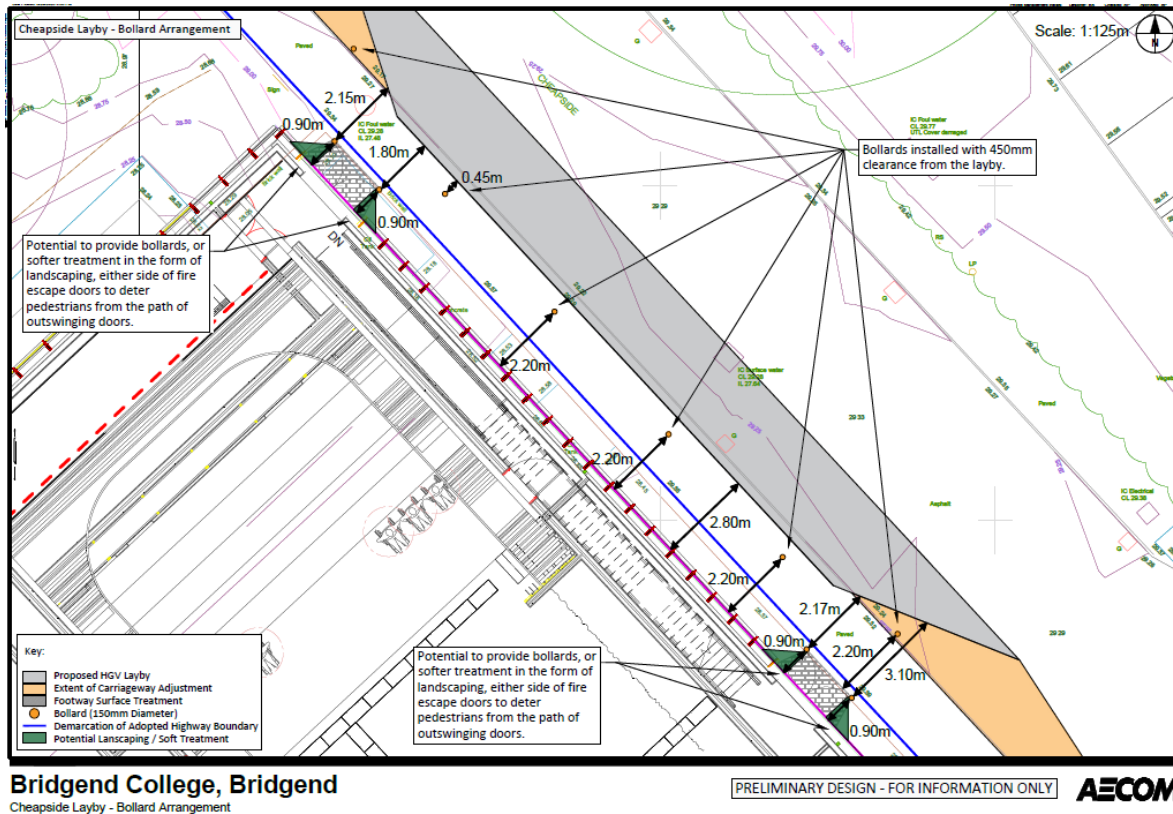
Draft Scheme with Road Safety Audit Recommendations
